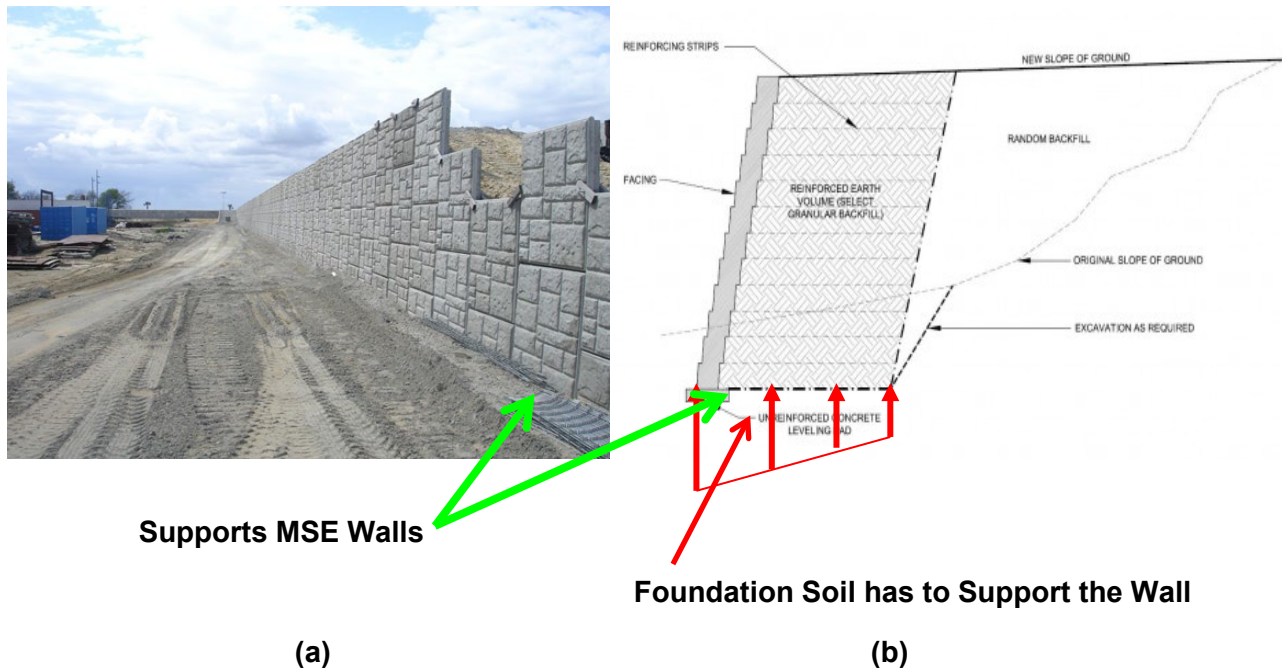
Photo of typical Mechanically Stabilized Earth (MSE) wall (a) with extent of the shallow foundation illustrated (b).
